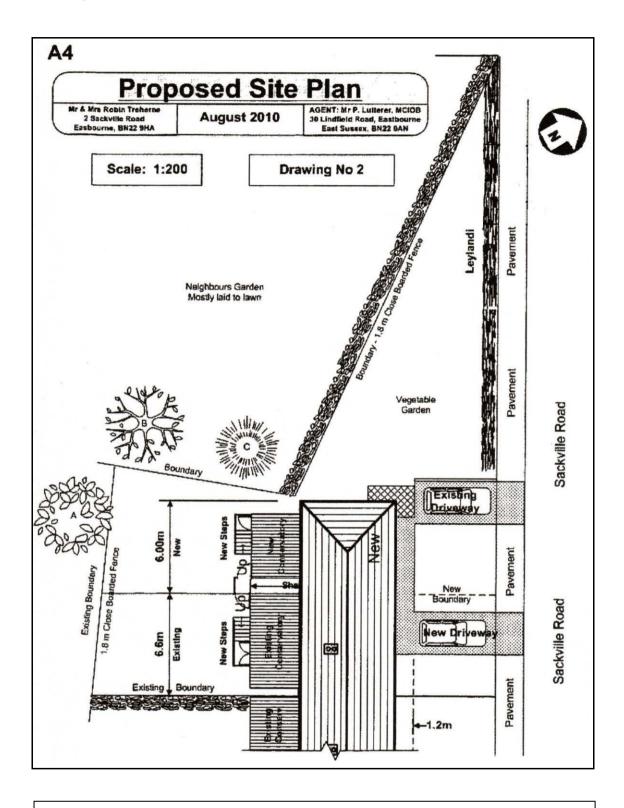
2 Sackville Road, Eastbourne: Development Plan (Adapted from architects drawing)
